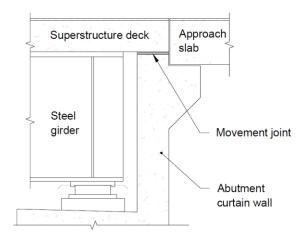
Superstructure deck cantilevers over the curtain wall to prevent water ingress onto the weathering steel girder
